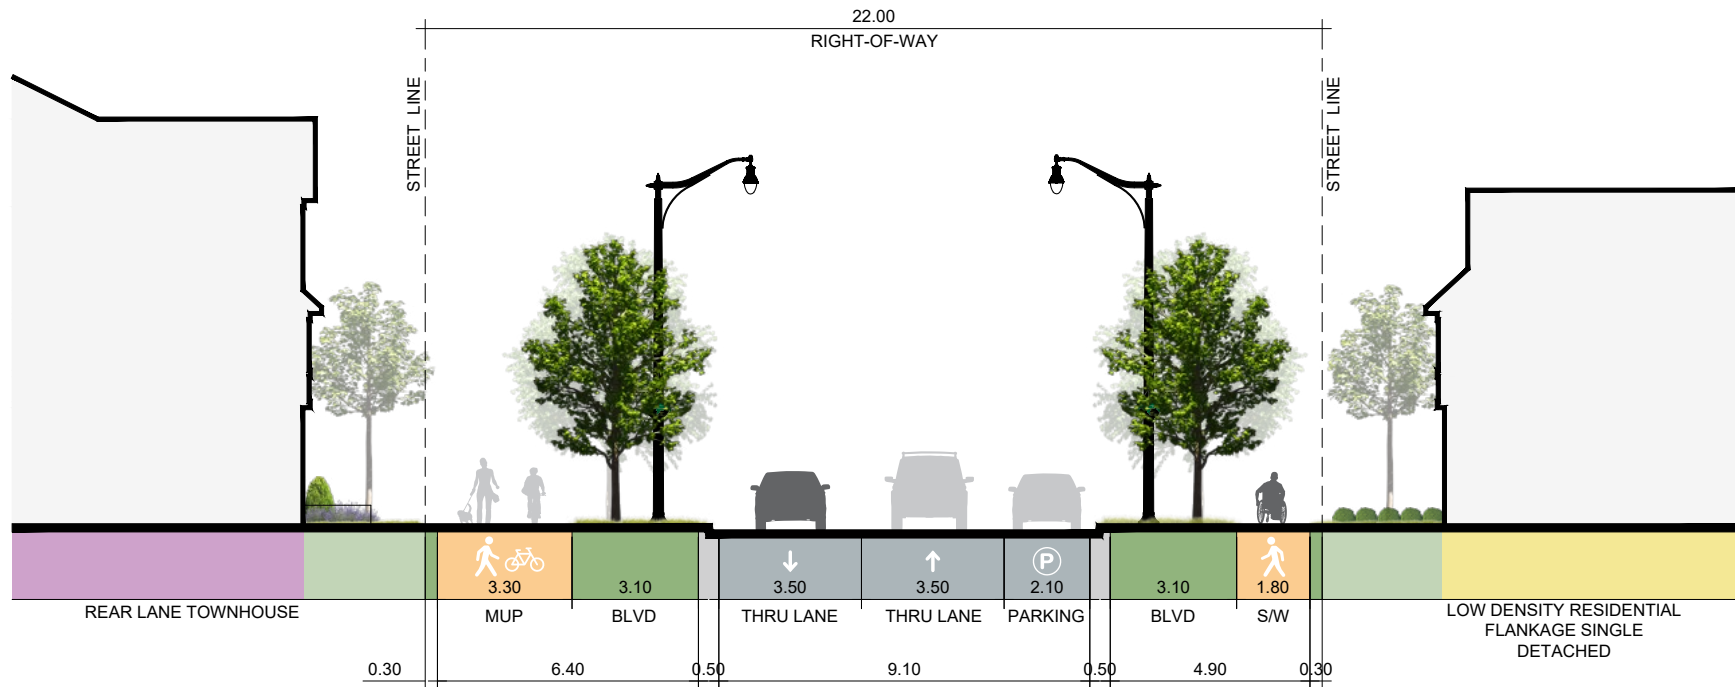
Proposed 22.0m Minor Collector Road ROW Cross Section
